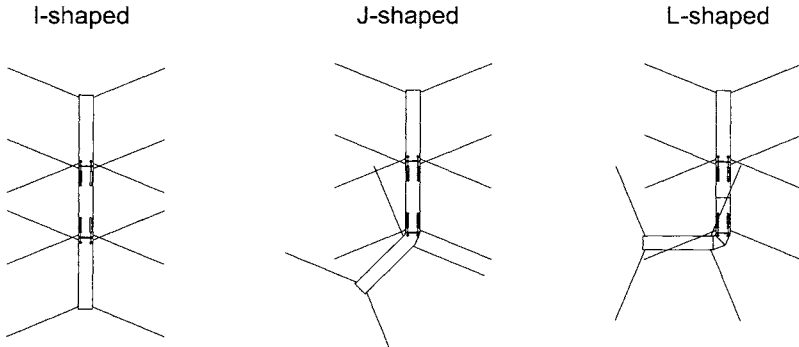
Tested layouts. L-shaped layout was tested in 2008 and results are compared to previous ones (I-shaped and J-shaped layouts).
